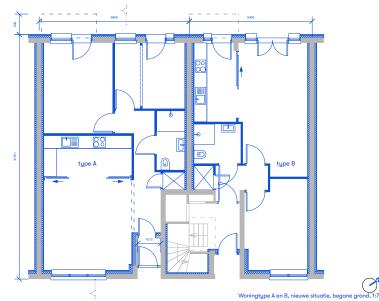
Jongert et al. (2023) floorplan renovation design Superuse Studios
